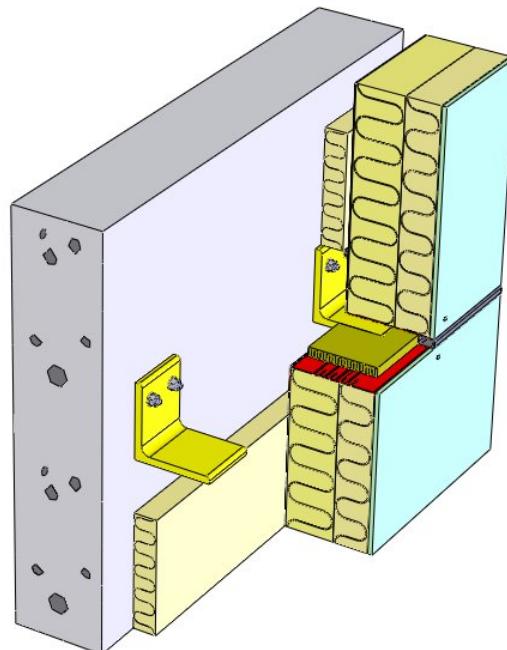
Exterior thermal insulation system in steel. The utilization of the system requires that the exterior slab of the concrete sandwich panel is removed, or that the exterior insulation system is attached to the load-bearing inside slab of the panel. One of the problems with old concrete panels is the poor durability of exterior slab.
